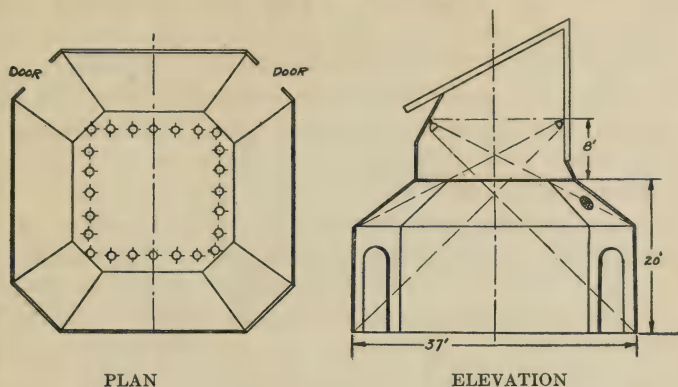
Fountain Room, Grand Central Art Galleries. Equipment used; twenty-four No. 33 X-Ray units with 200-watt Madza Daylight lamps.
